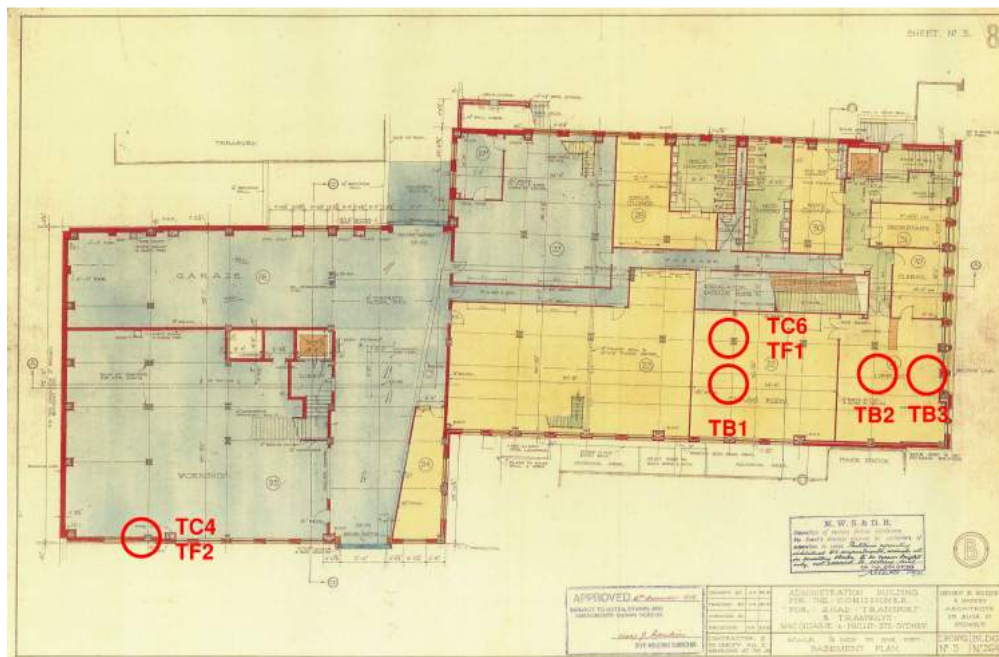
Location of tests for columns and beams (underside of Ground/L3) and footings (subbasement/L1)
